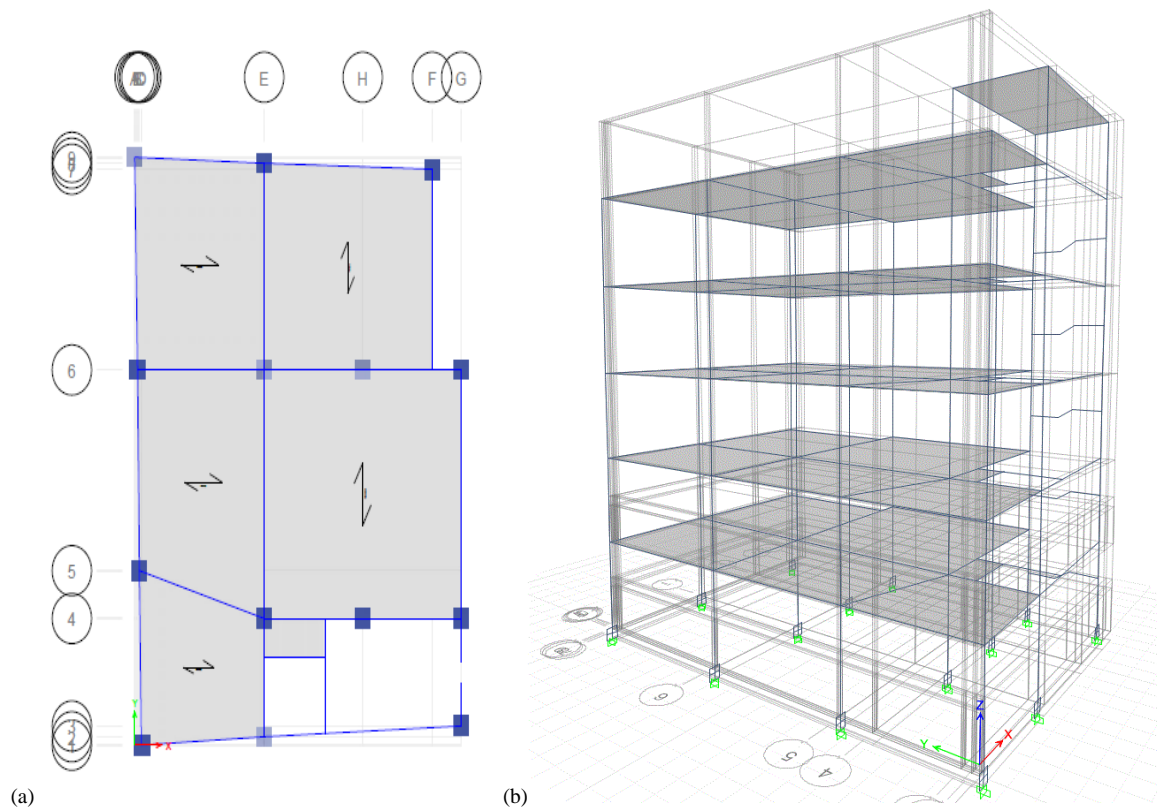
(a) Typical plan of the building model, (b) 3D view of ETABS model
